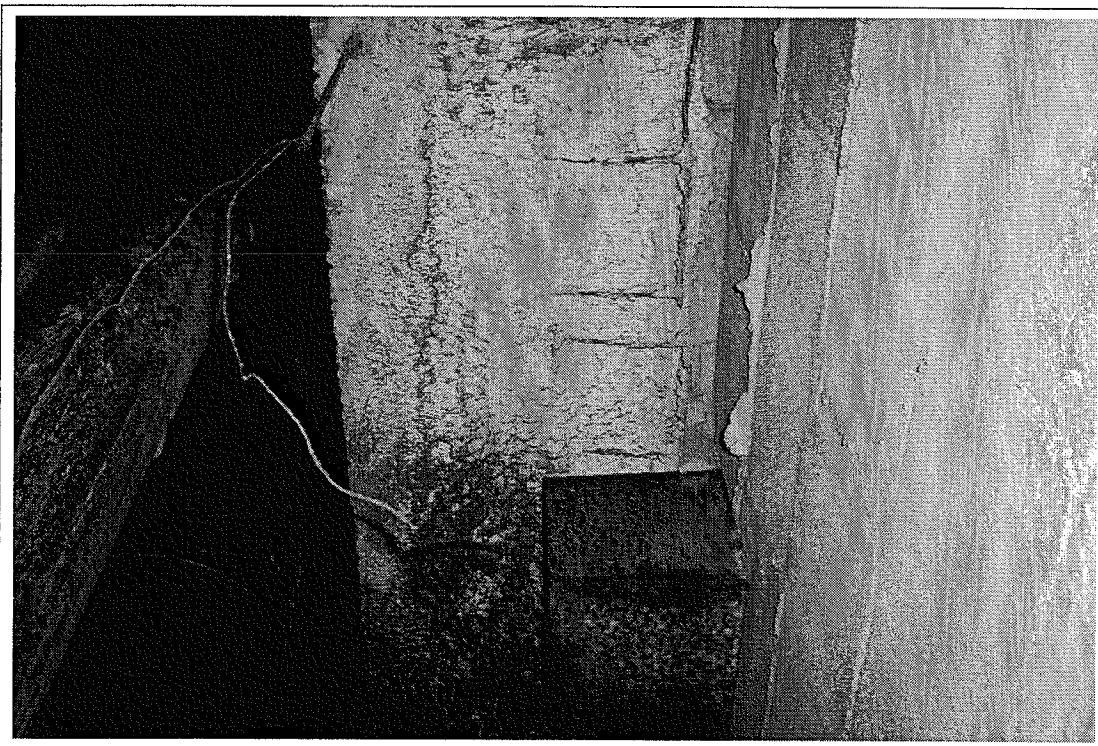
5th floor, NE Fresh Air Shaft - View of fireproofing on concrete structure and black iron
